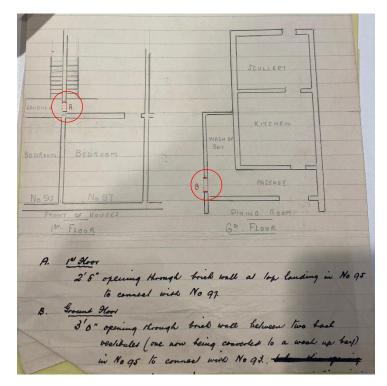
Sketch plan dated 1942 of the proposed opening between no. 95 ad 97 Drummond Street Source: Anglican Diocese of Melbourne Archives
